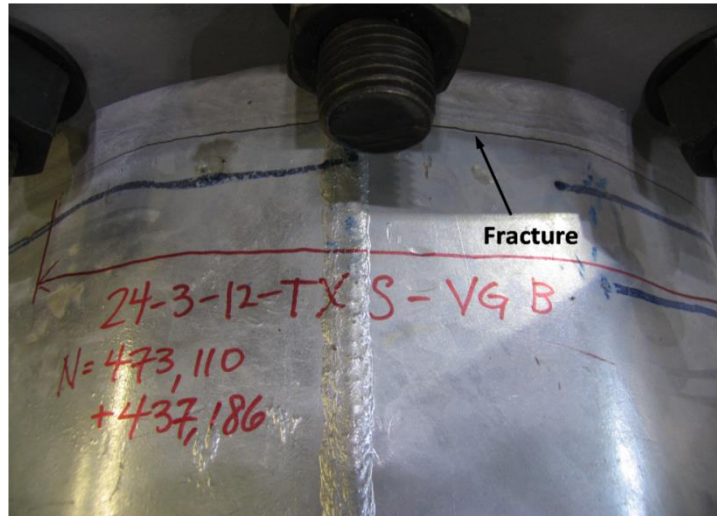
Shaft to base plate crack location (Stam, 2009)
